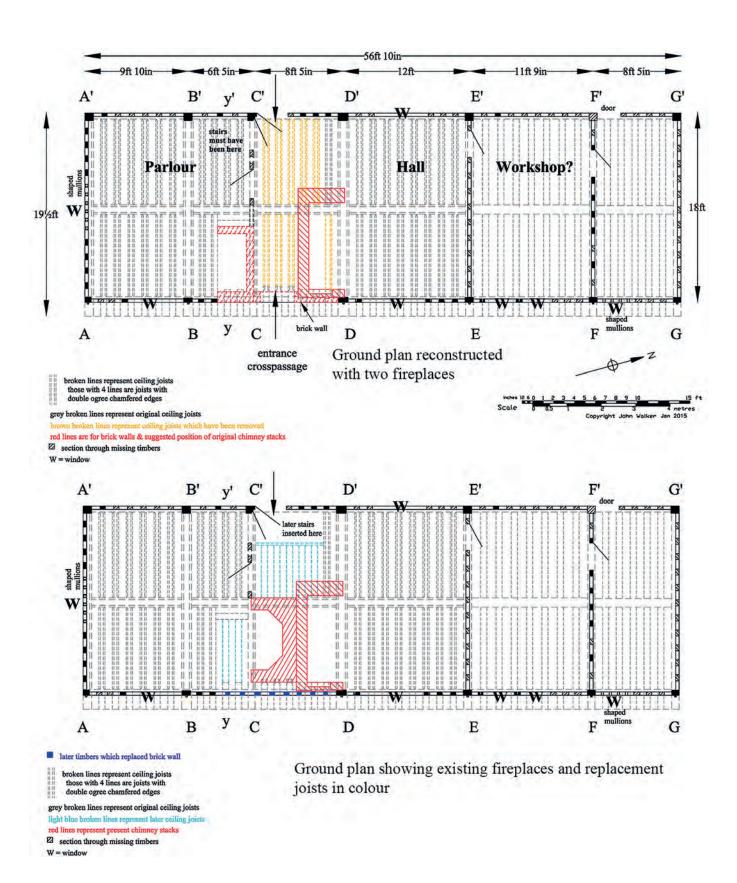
Ground floor plans of 49 Swan Street. Above, reconstruction as built with two brick fireplaces, the northern one being that there today. Below, reconstruction showing fireplaces as they are today and replacement joists in colour
